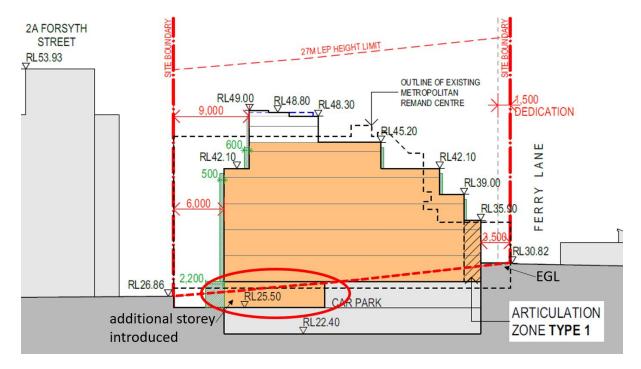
Proposed residential flat building envelope (section C) with additional storey introduced below existing ground level. Existing ground level indicated by red dashed lines.
